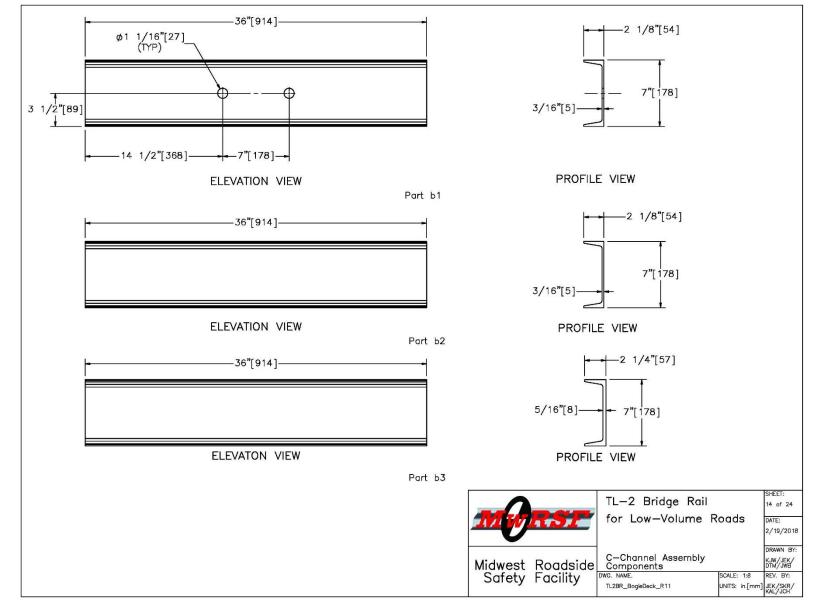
Bogie Testing Matrix and Setup, C-Channel Assembly Components
